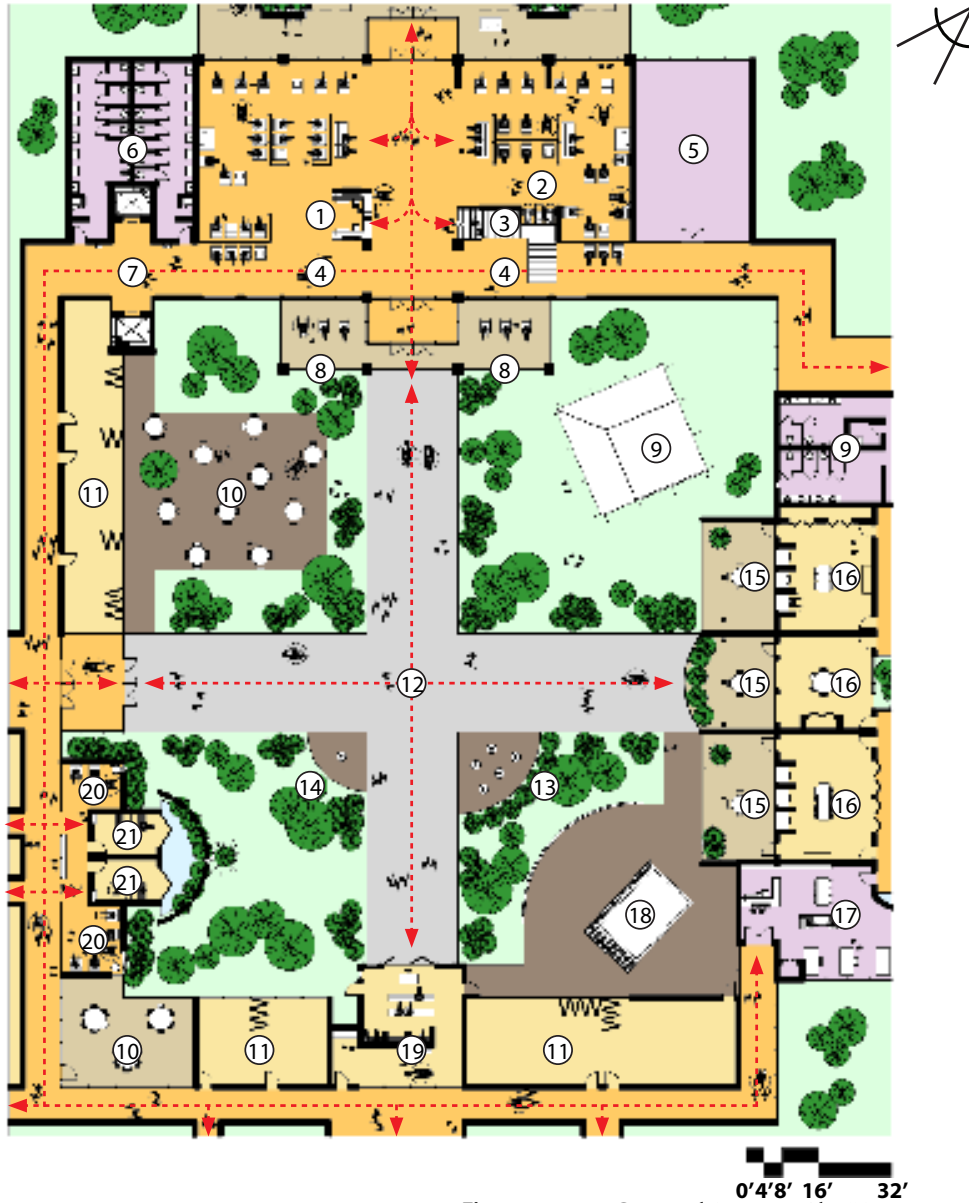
Courtyard Diagram - Plan View
